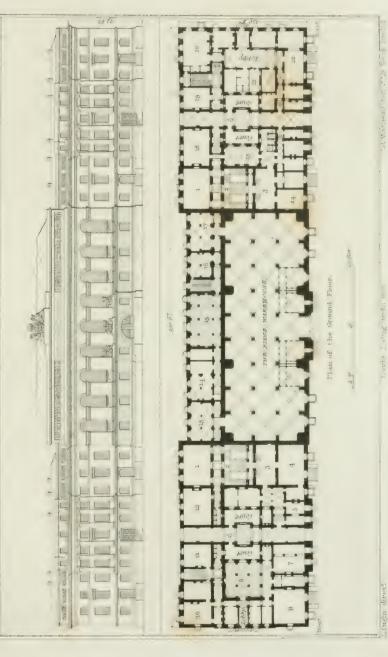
PLATE II. Elevation of the South, or Water Front, and Plan of the Ground Floor. 1.1. Entrance Halls. 2.2. Great Staircases. 3.3. Halls. 4.5. Landing Surveyors. 7. Wood Farm Office. 8. Tide Waiters' Room. 9. Tide Surveyors. 10. Inspectors of the River. 11. Gaugers. 12. Landing Waiters. 13. Warehouse. 14. Coast Waiters. 15. Coast Office Long Room. 16. Coast Bond Office. 17. Warehouse. 18. Coffee Office. 19. Housekeeper's Office. 20. Searchers' Clerks. 21. Merchants' and Brokers' Room. 22. Comptrolling Searchers. 23. Appointers of the Weighers. 24. Office for printed forms for the Plantation Department.
